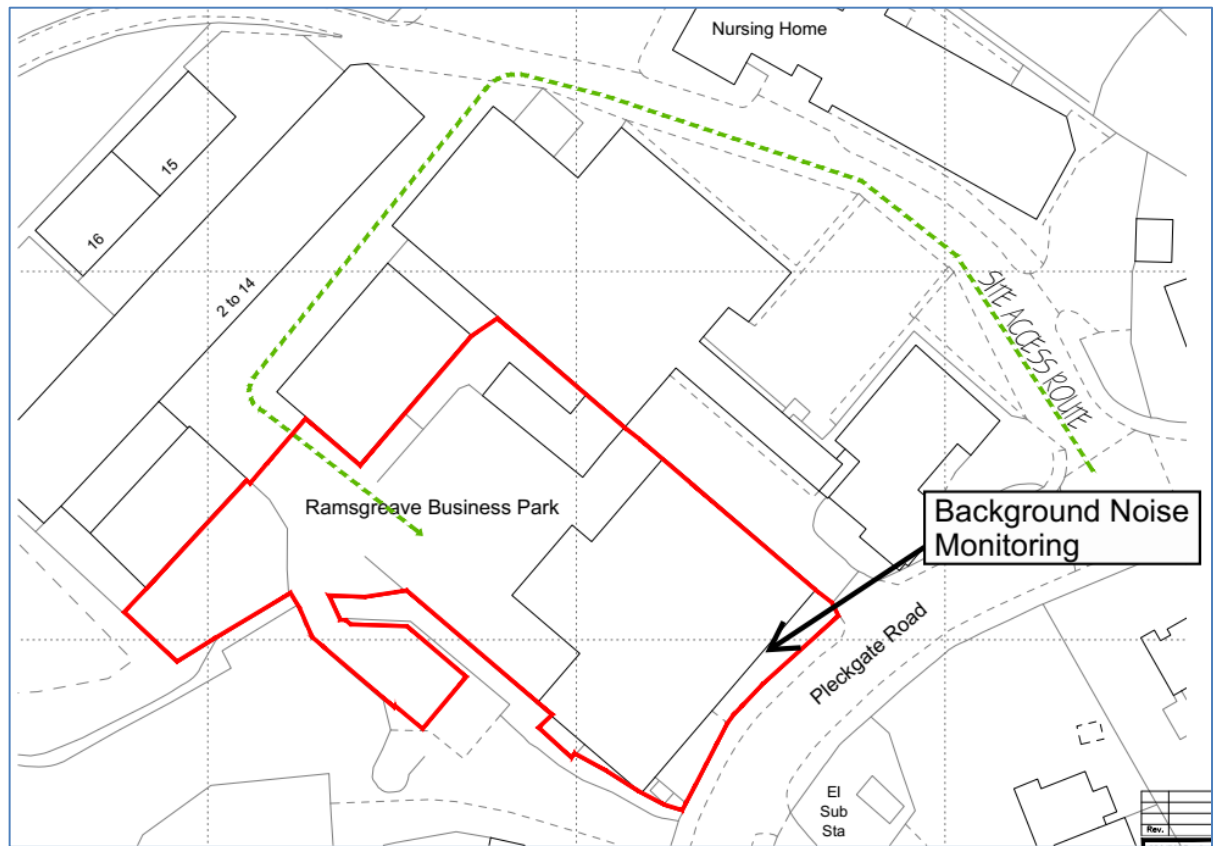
Existing Site Plan & Background Monitoring Position [façade]
